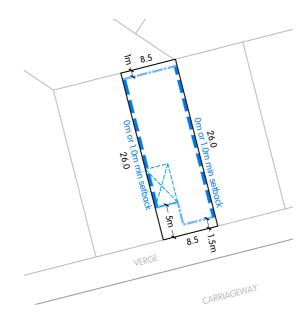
| Clarkefield Township Zone - Main Street Character Area: Building Envelope 01 (Front loaded, under 300m2)
